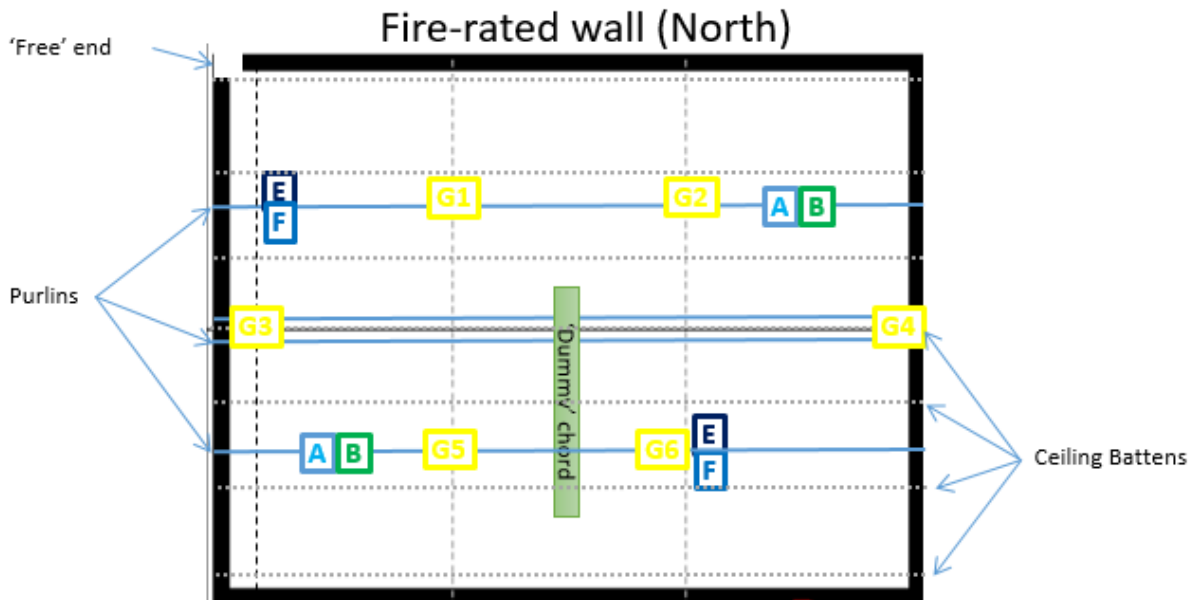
Experiment #1 ceiling and roof device locations, plan view
